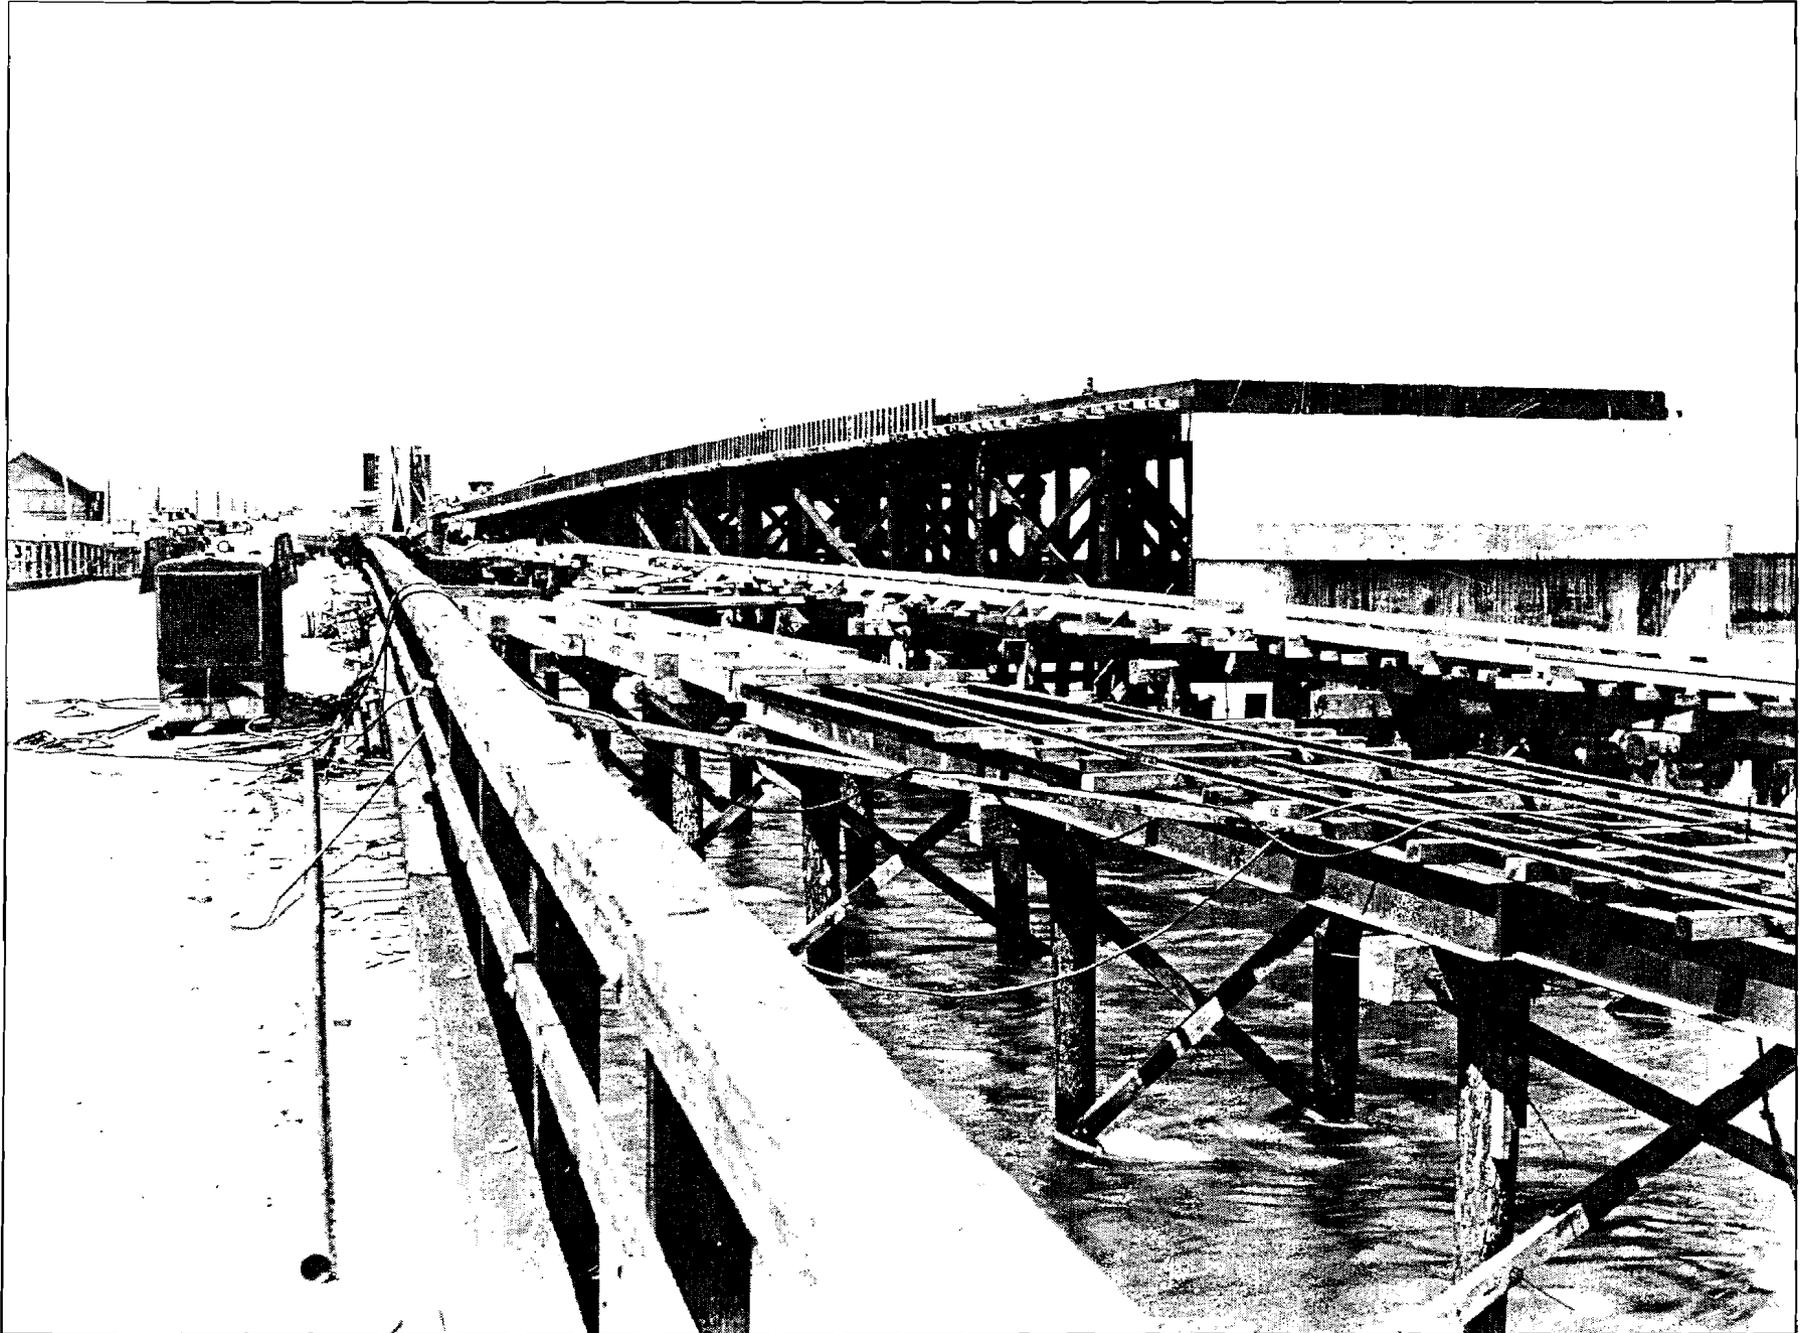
View toward north from old bridge showing Cullen Bridge under construction. June 12, 1939. Delaware State Highway Department collection. Image #0328. Delaware Public Archives, Dover.
